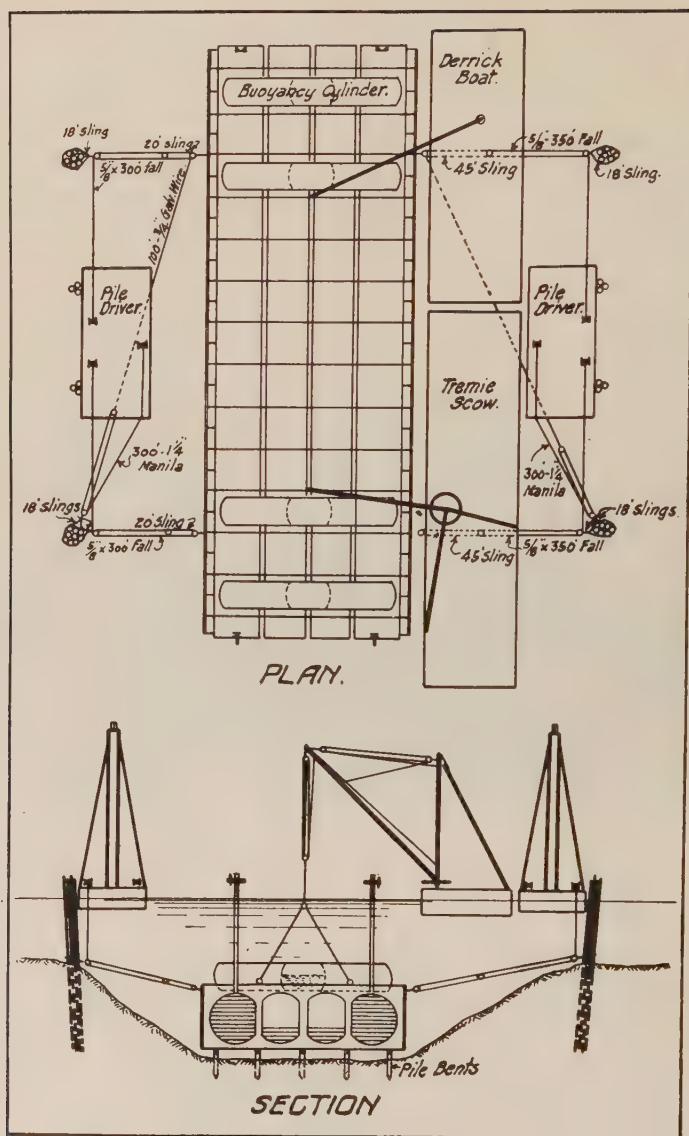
TYPICAL PLAN FOR LOWERING OF STEEL TUBES FOR THE NEW HARLEM RIVER TUNNEL OF THE LEXINGTON AVENUE SUBWAY.
